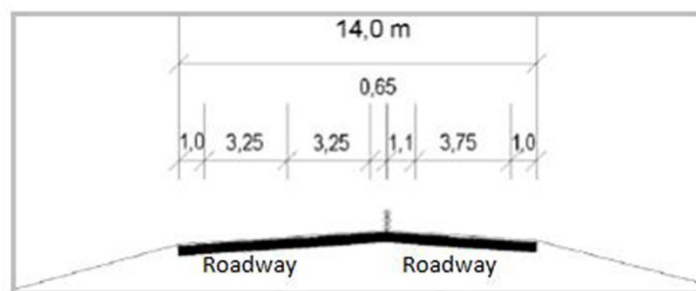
Type section for a rural road free from opposite traffic, if new construction
